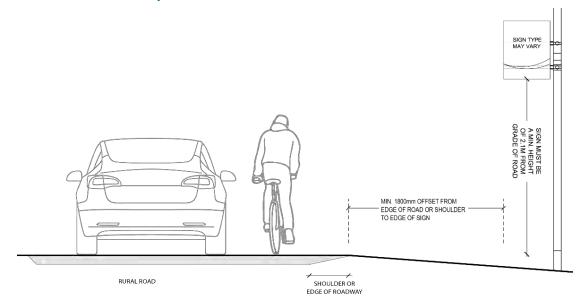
Rural Street & AT Route Signage Placement. Min. 1800mm from edge of sign to edge of roadway or shoulder. Minimum 2100mm vertical clearance from bottom of sign.
